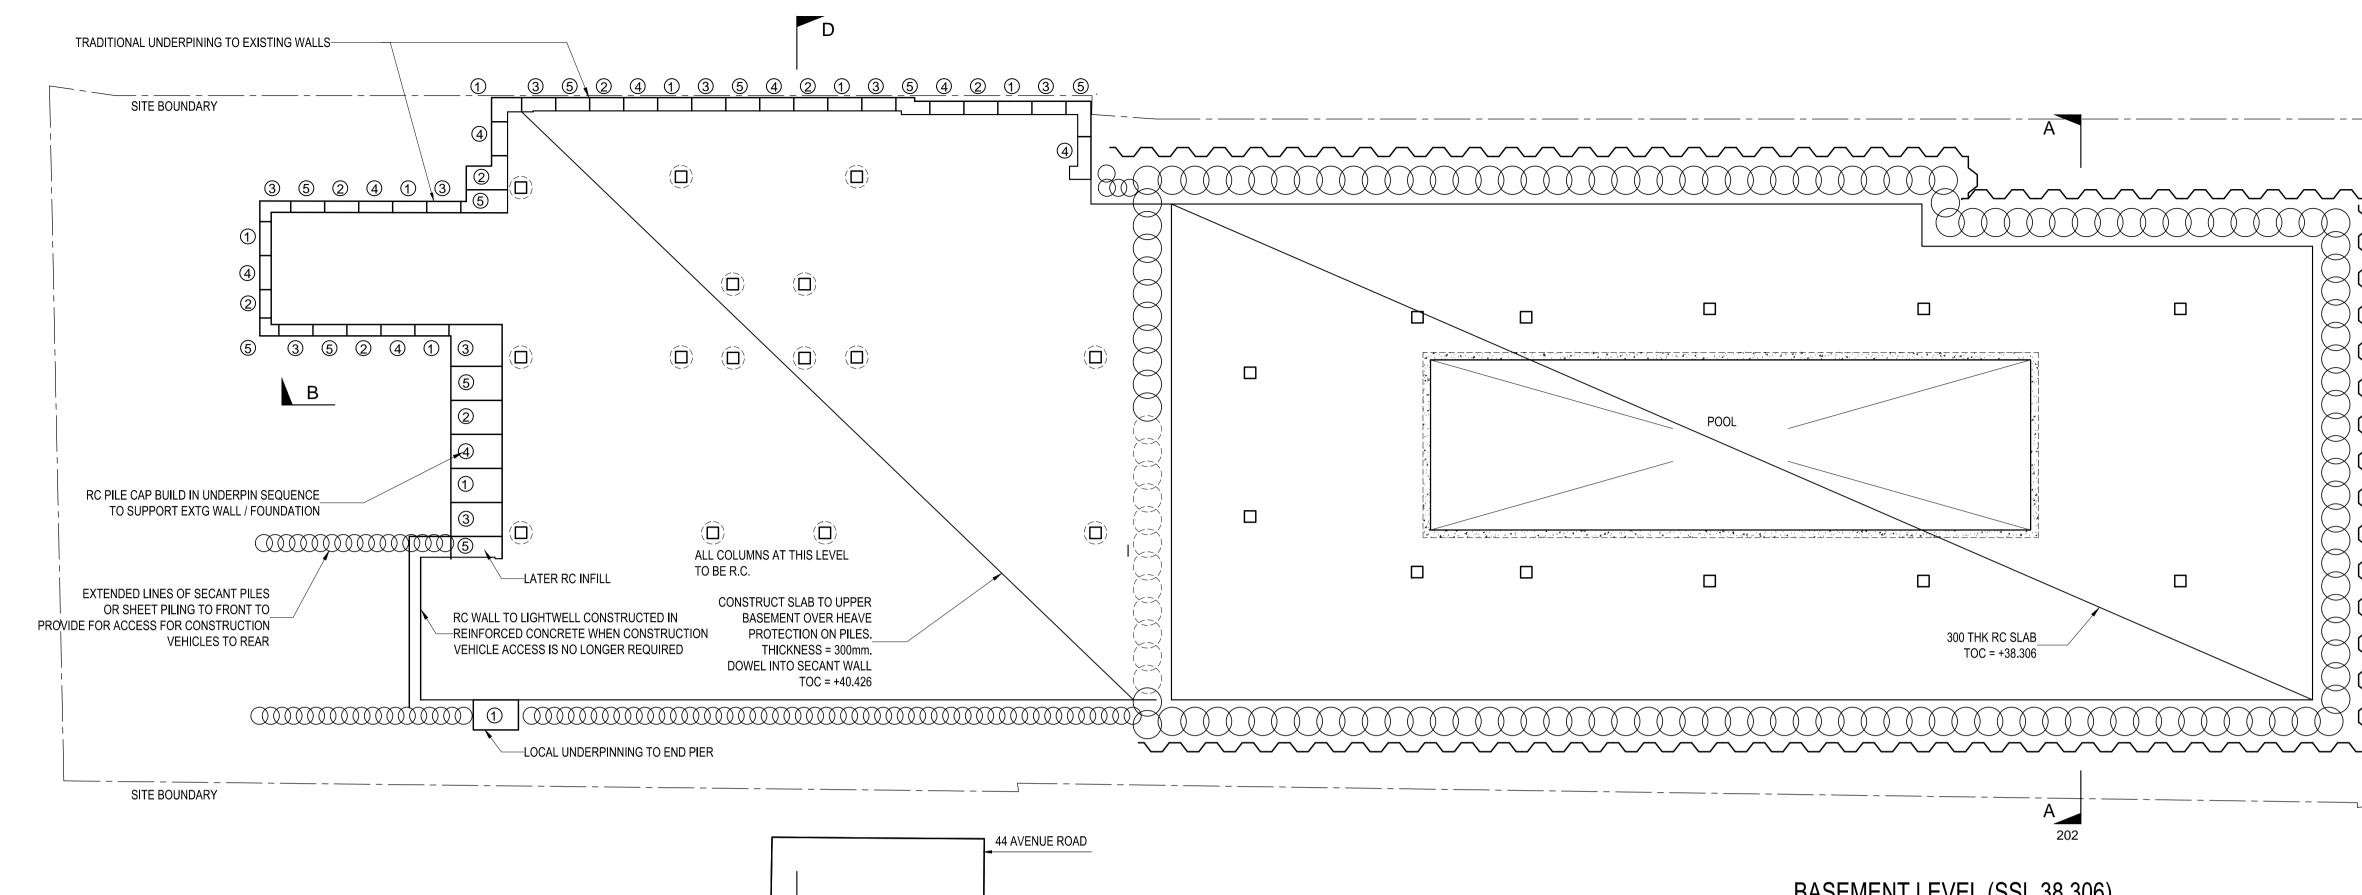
Example of Temporary works for construction access to build a 6m basement where little access existed before– London (Ref 3 Ischebeck Titan)
